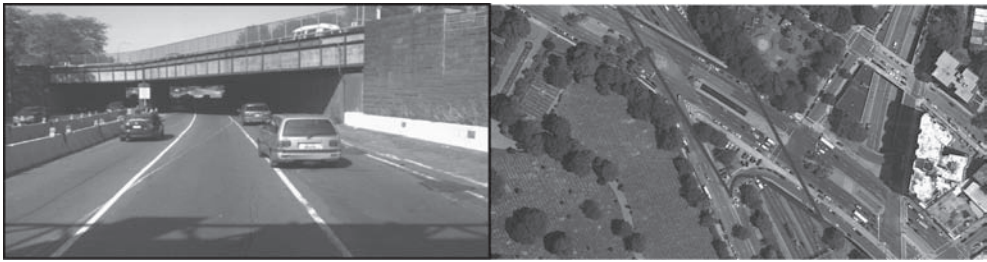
Existing Queens Blvd Bridge over the Van Wyck Expressway (Aerial and Elevation).
